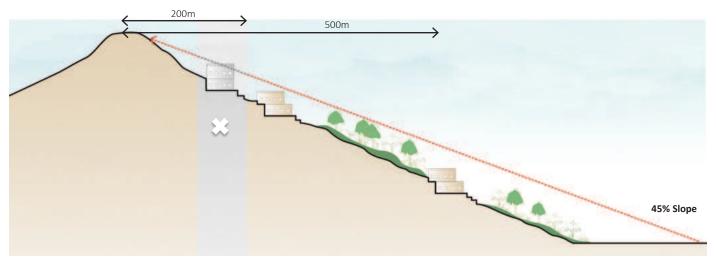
Sections showing ridge line zone. Plots adjacent to the ridge line are subject to additional scrutiny and must provide a 2 Point Study or LVIA
